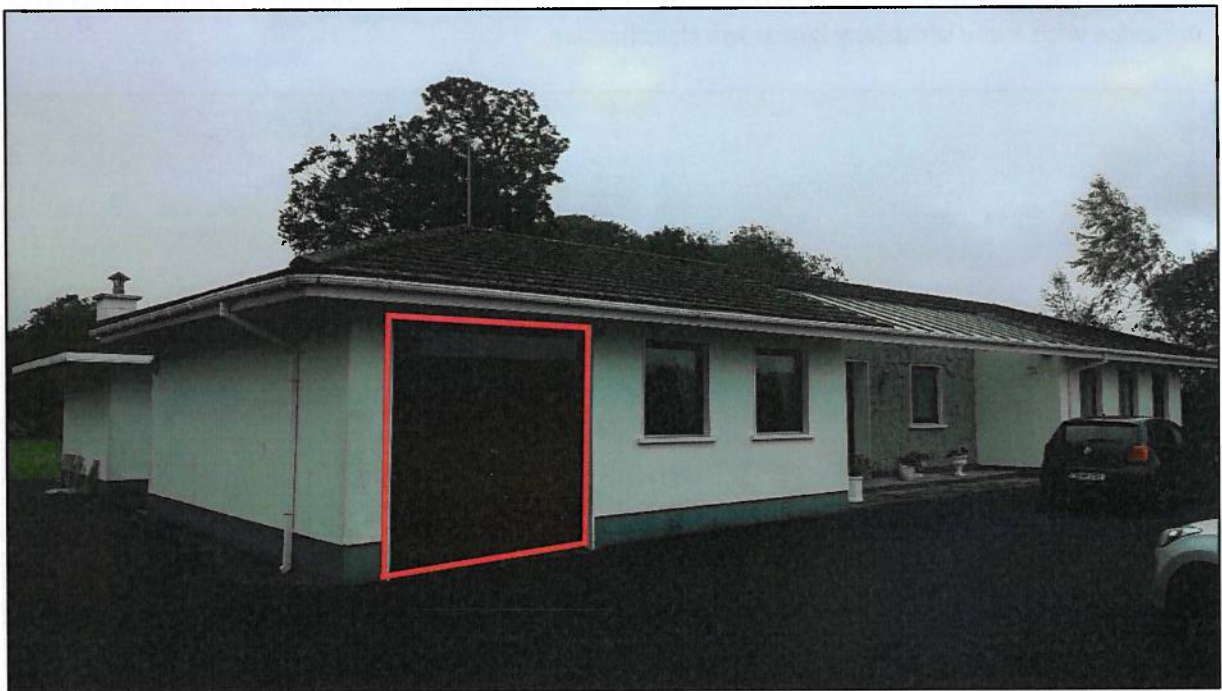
Front view of existing dwelling with garage door (outlined in red) to be removed and replaced with a window.
